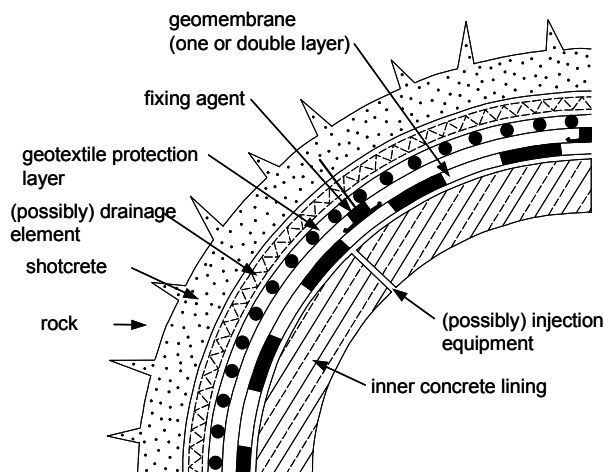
Structure of geomembrane sealing systems in the vault section of tunnels via mining construction method
